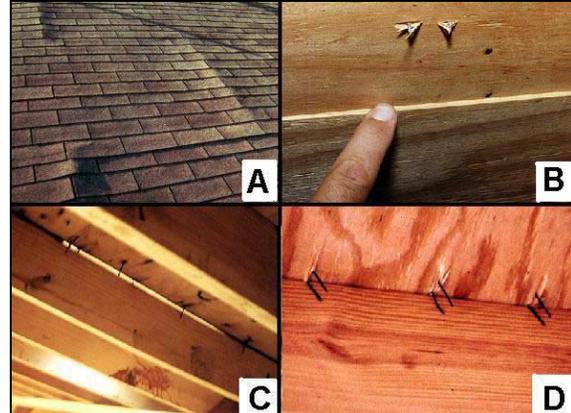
Roof deck deficiencies not caused by wind effects: A) warped decking beneath roof shingles, B) lack of space between deck boards, C) warped decking in attic, and D) decking not fastened to rafters.
